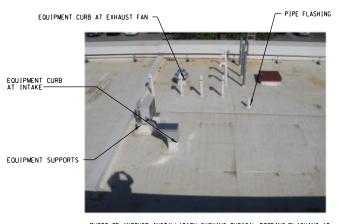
PHOTO OF ANOTHER INSTALLATION SHOWING TYPICAL ROOFING/FLASHING AT MECHANICAL EQUIPMENT.
